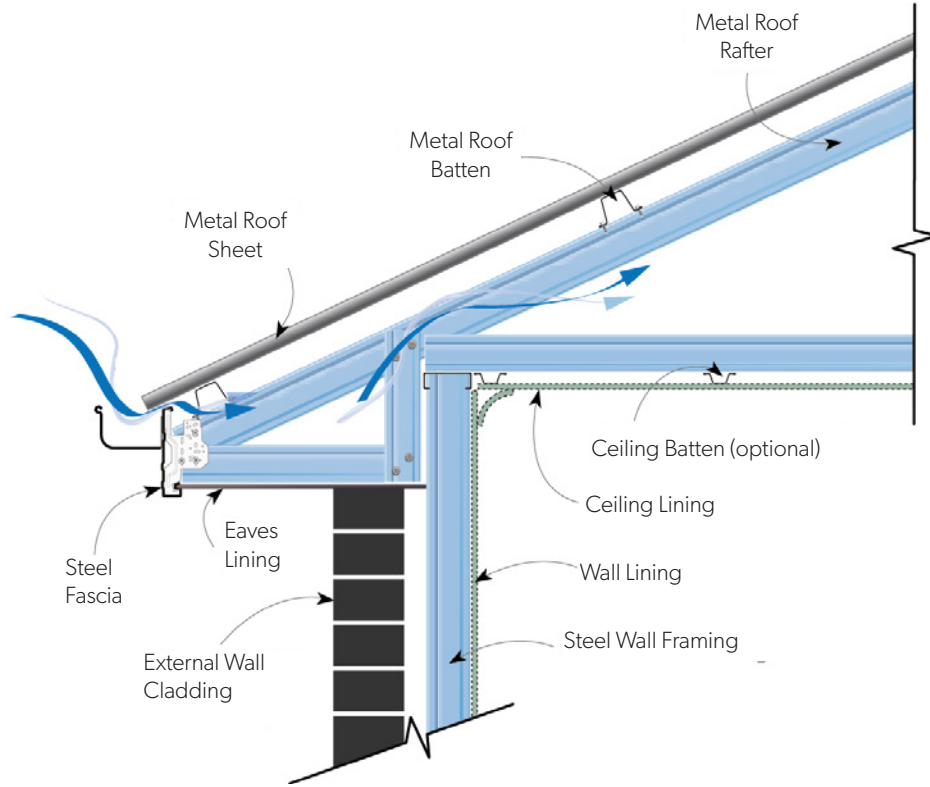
Low level profile ventilation (15 to 75 degrees) with membrane extended 25mm into the eaves gutter (Drainage control)
